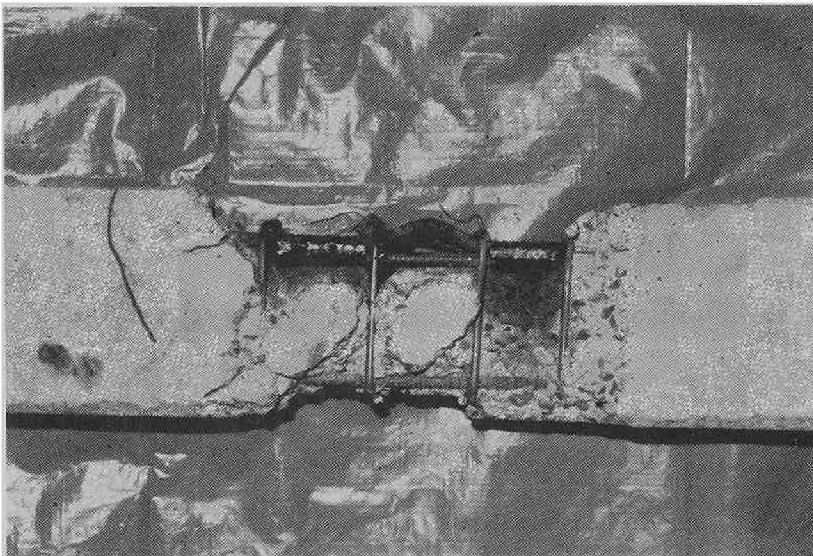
Type II repair: Welding new steel to the reinforcing bars.
